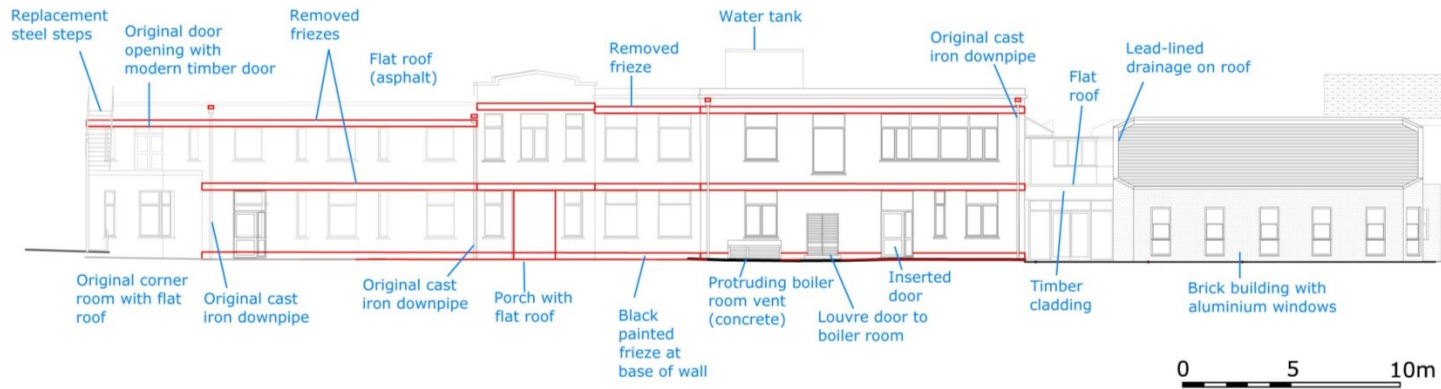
North and north-west elevations of Quadrangle and Link Building.
